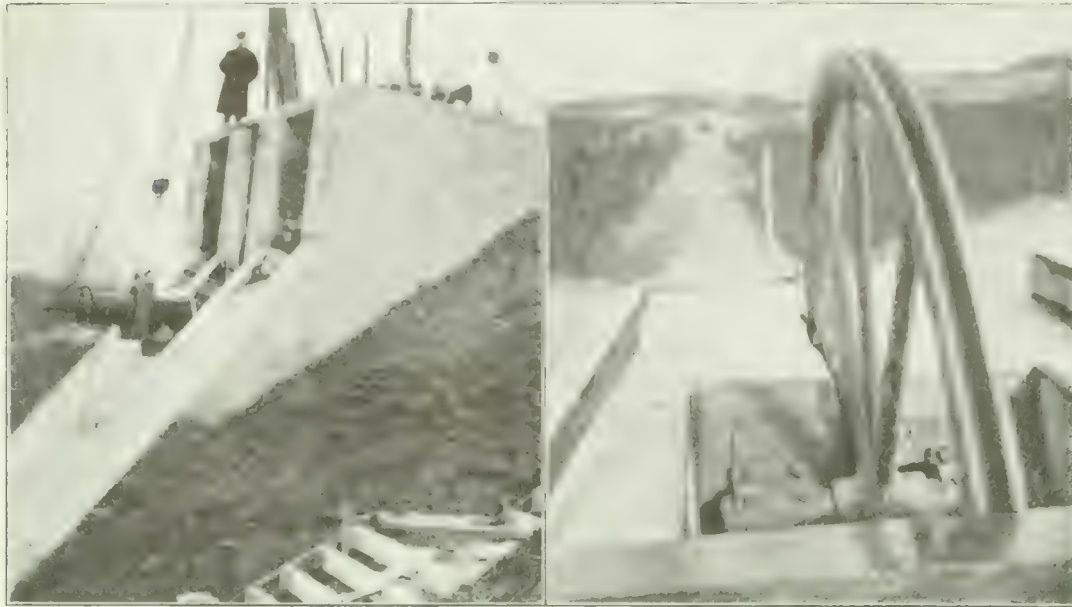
Views of Colt's Point Anchorage. At Left, the Concrete Block Before Erection of Sheave. Automatic Stop Hanging from Block and Tackle. At Right, the Traction Sheave in Place.
